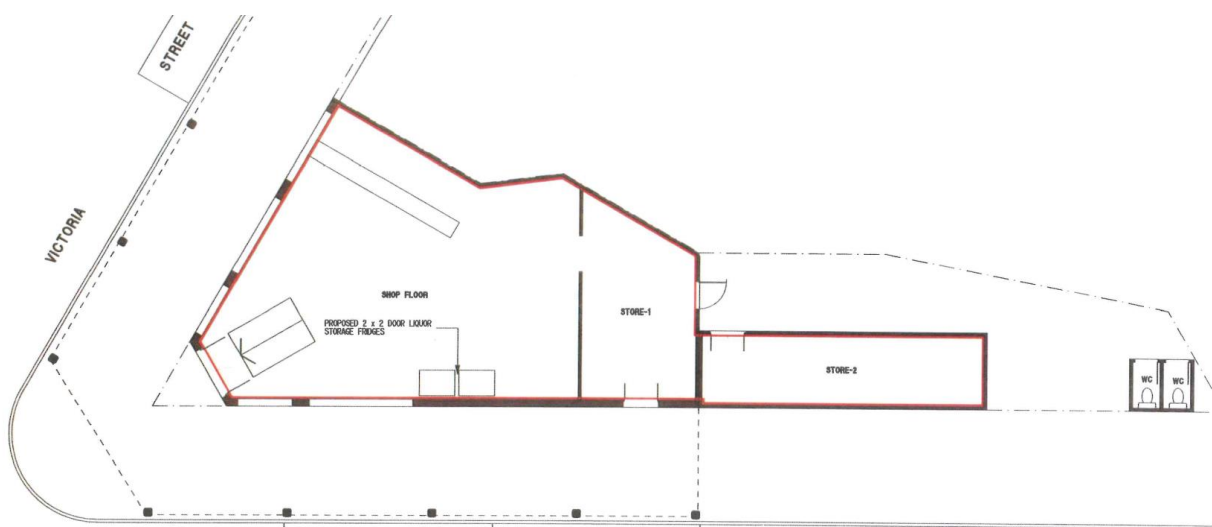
Proposed Redline Plan as provided by the Permit Applicant.
